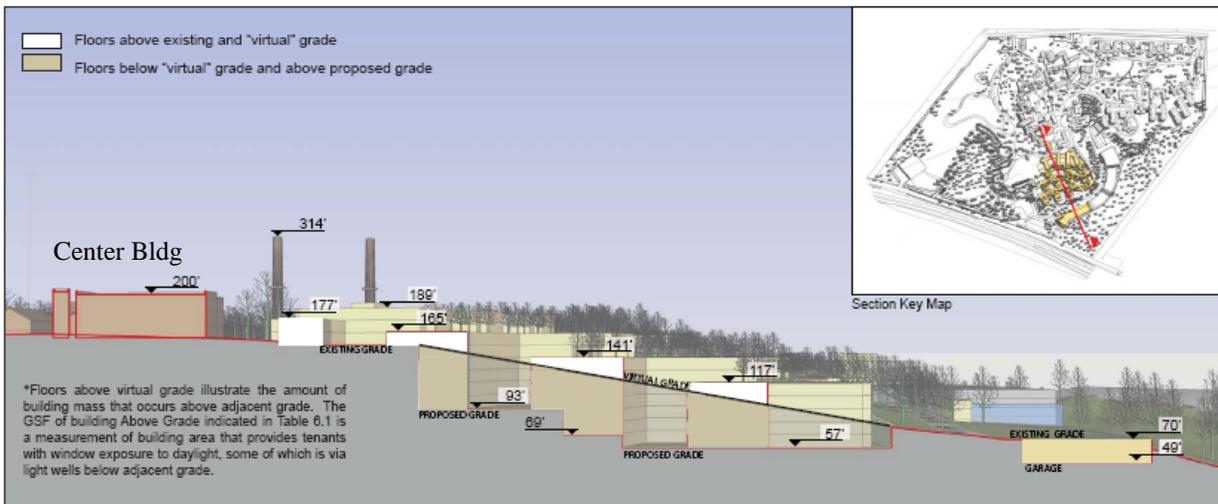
SITE SECTION (at U.S. Coast Guard Building)
